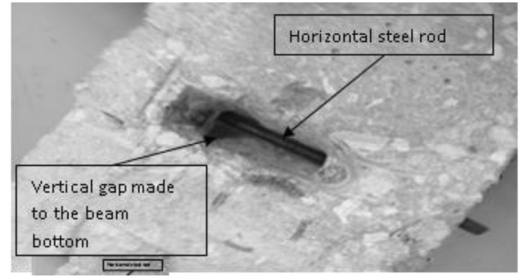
Real picture showing the beam with the horizontal steel rod before applying the FRP sheets and epoxy application
